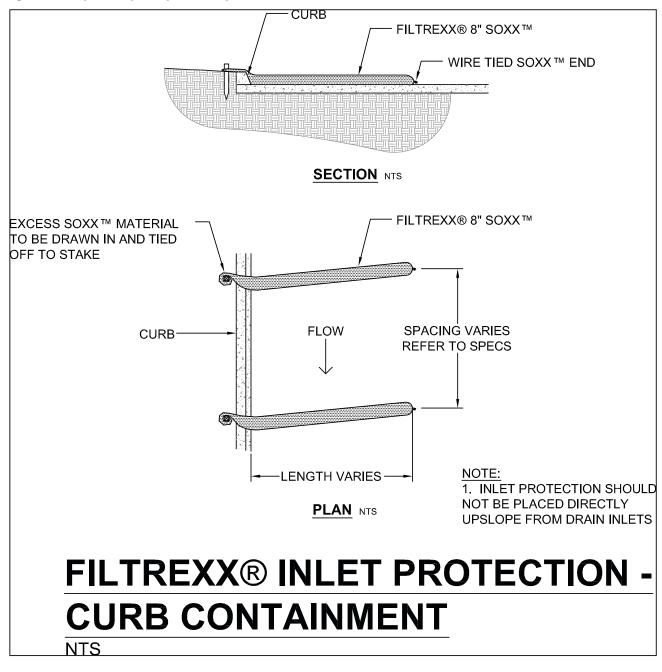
Engineering Design Drawing for Curb and Drain Inlet Protection
